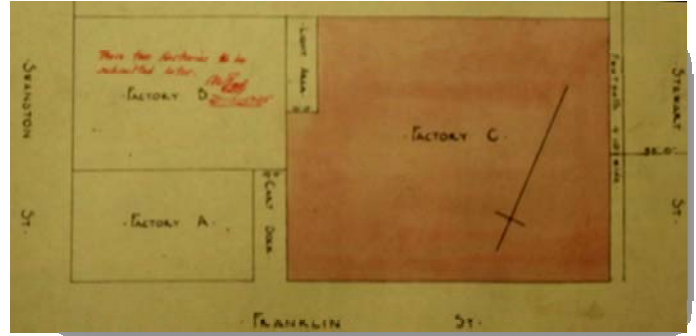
Block Plan 1925, factories A, B, C (Building Permit Application)
